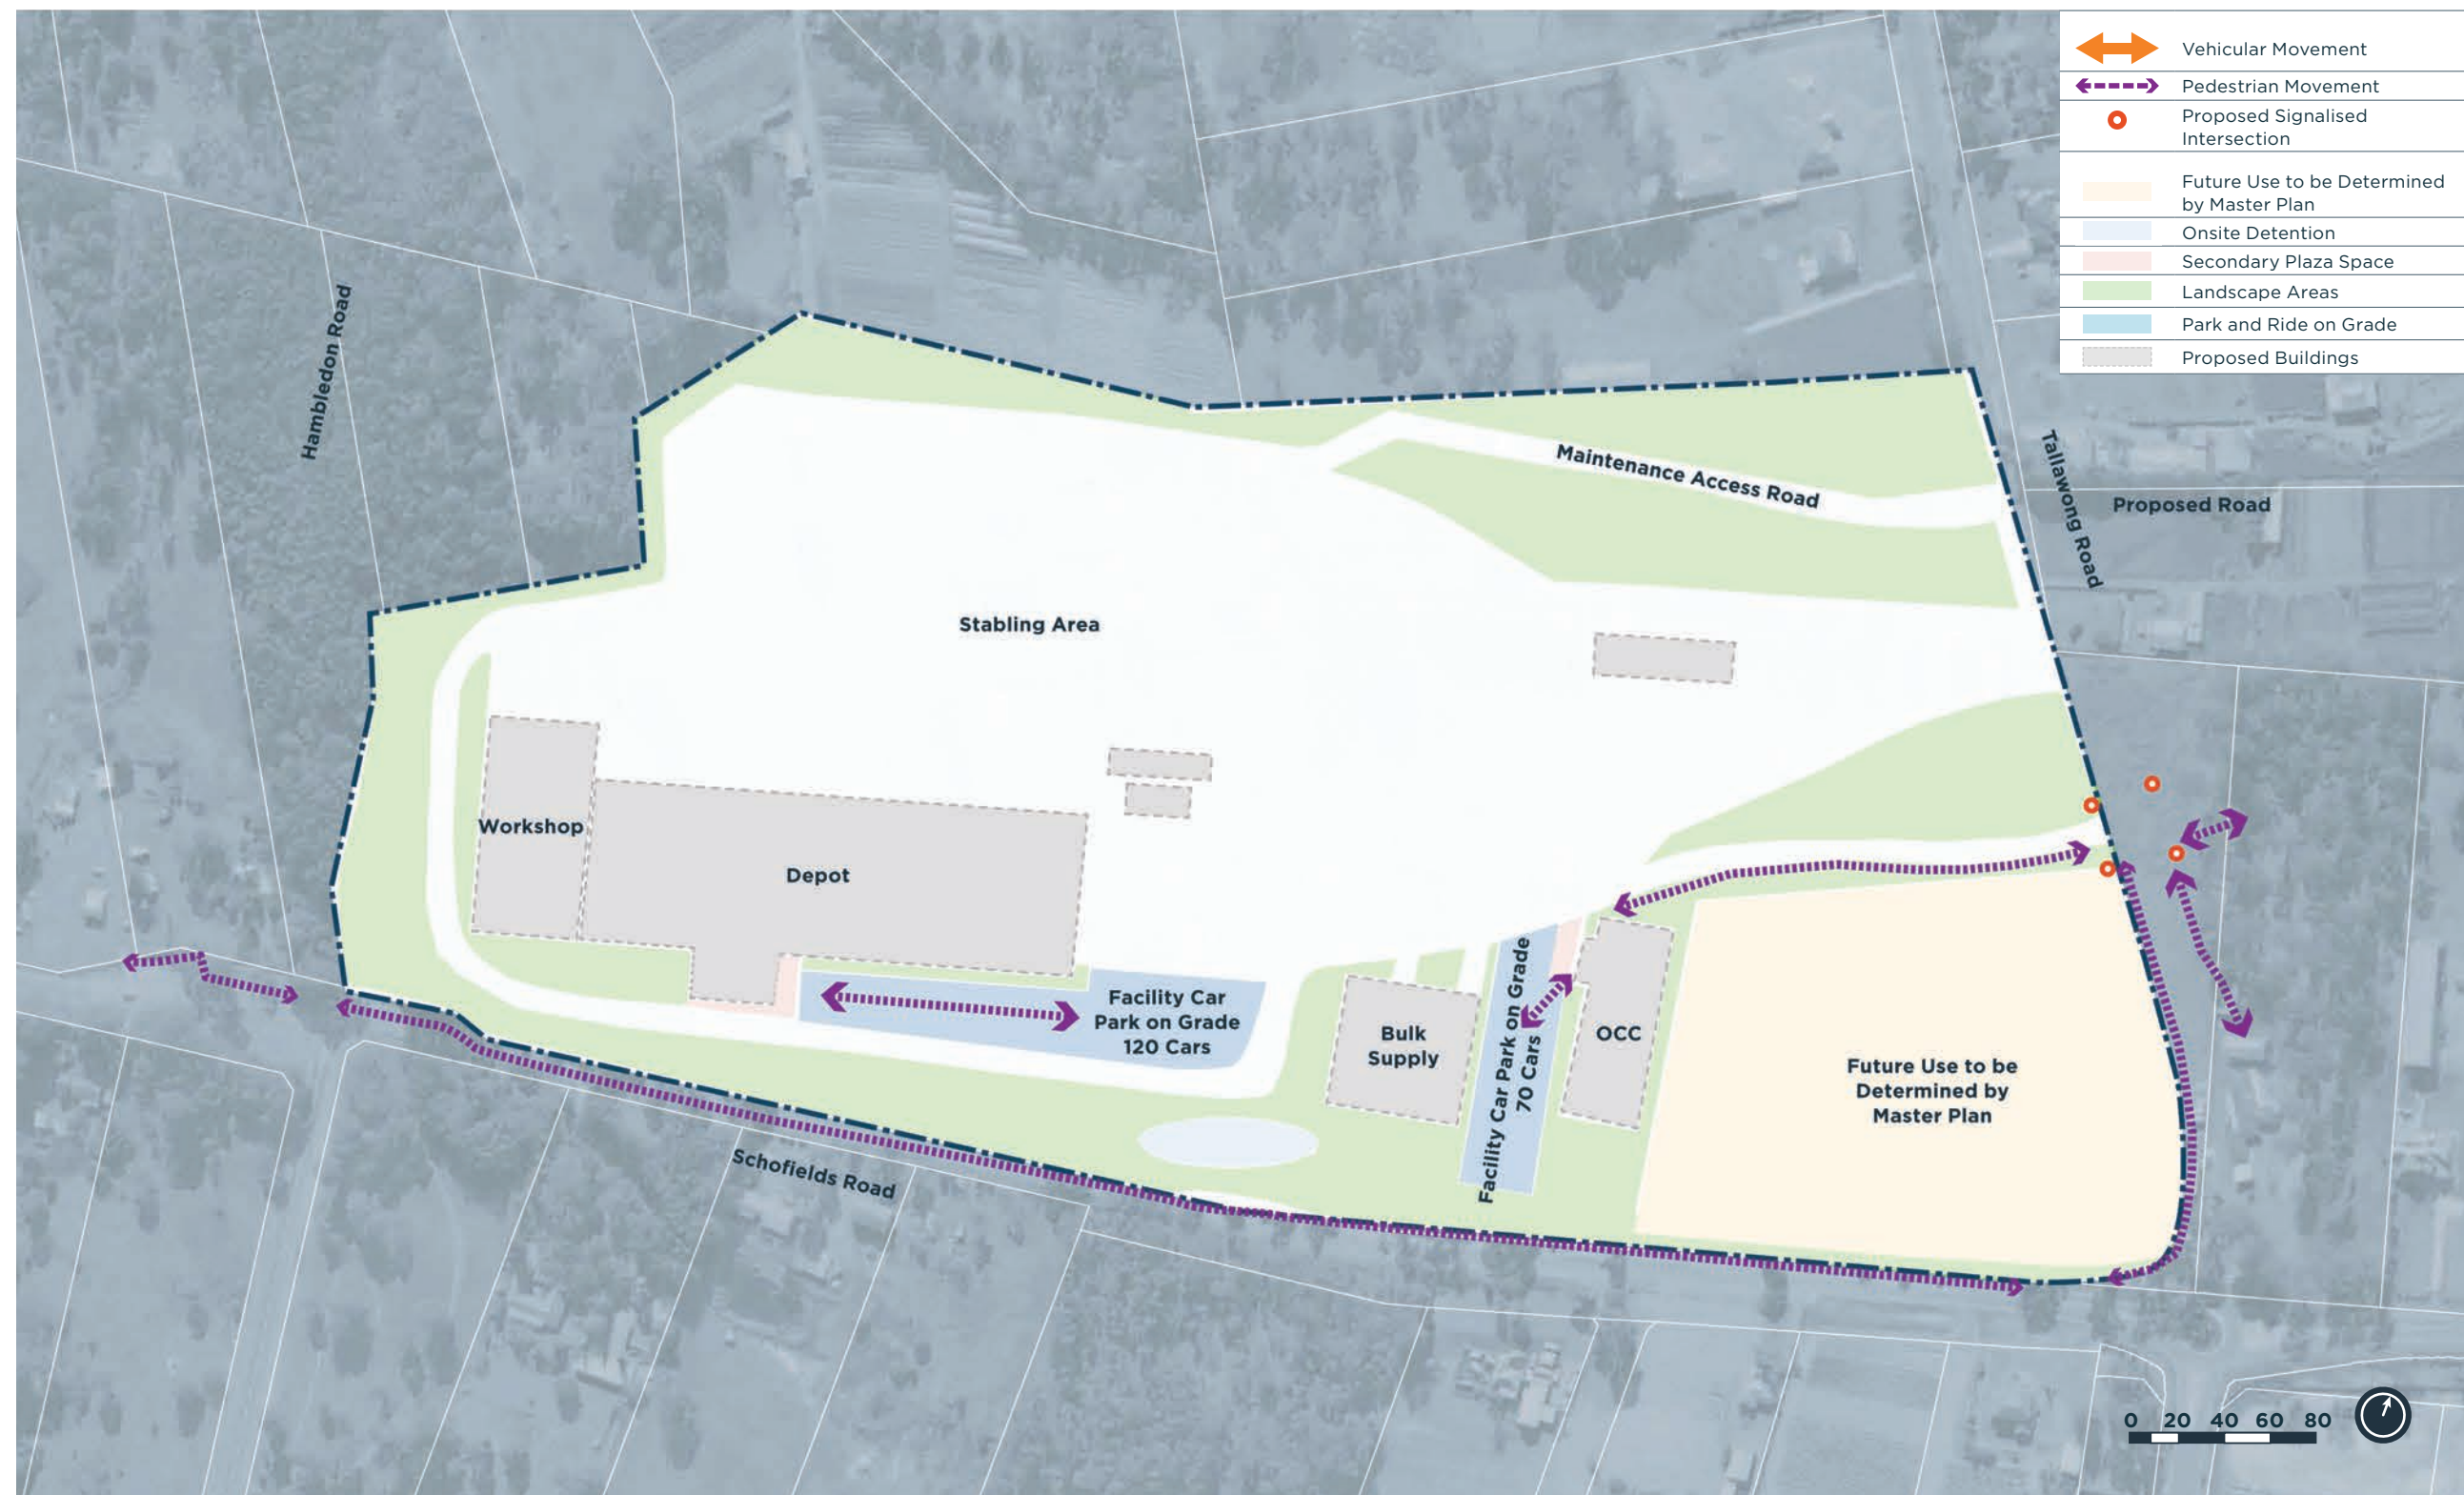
Tallawong Stabling Facility - Indicative layout
